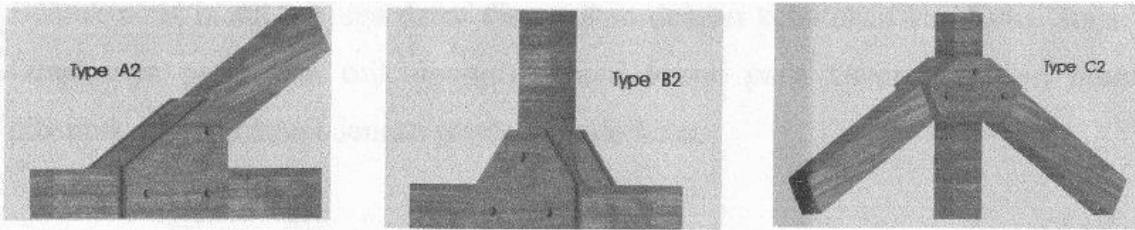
Type of densified agathis plywood as gusset and its connection details on wood roof construction
